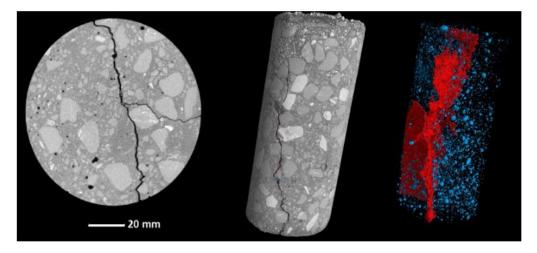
Cracking of Concrete Sample (first & second), 3D Cracks & Porosity View (right) (Boshoff 2019)
